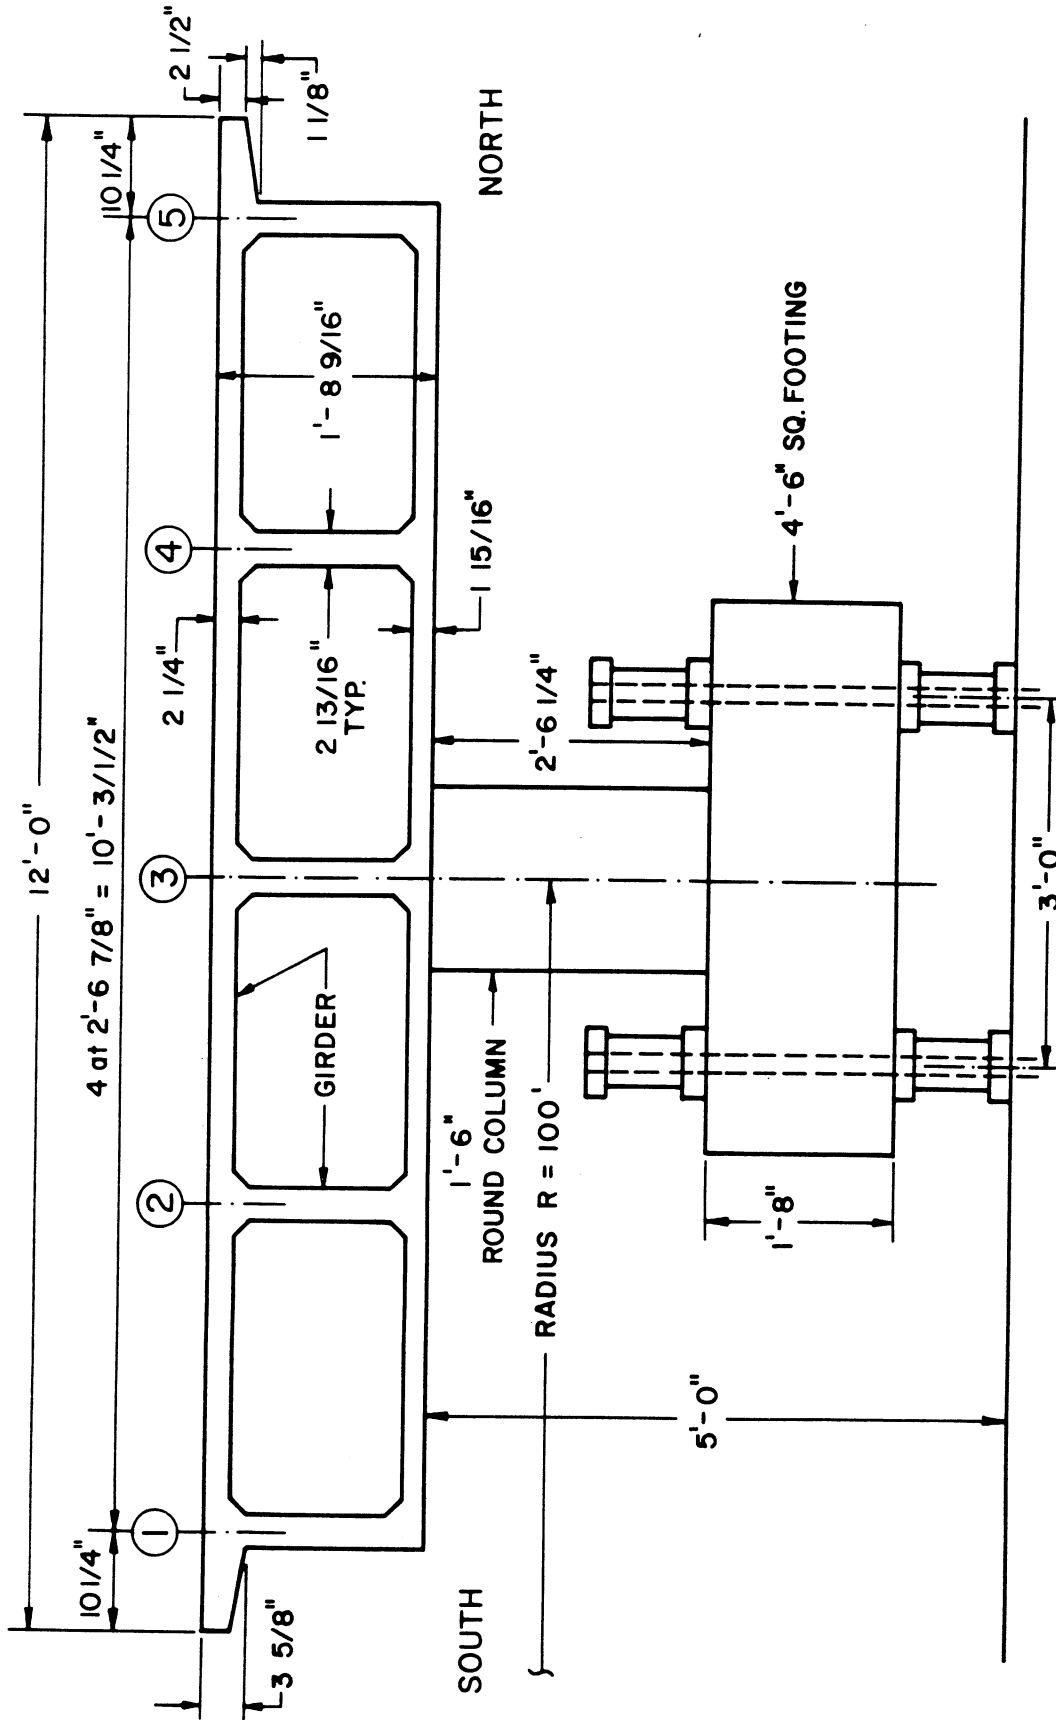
TYPICAL SECTION OF BOX GIRDER BRIDGE MODEL
